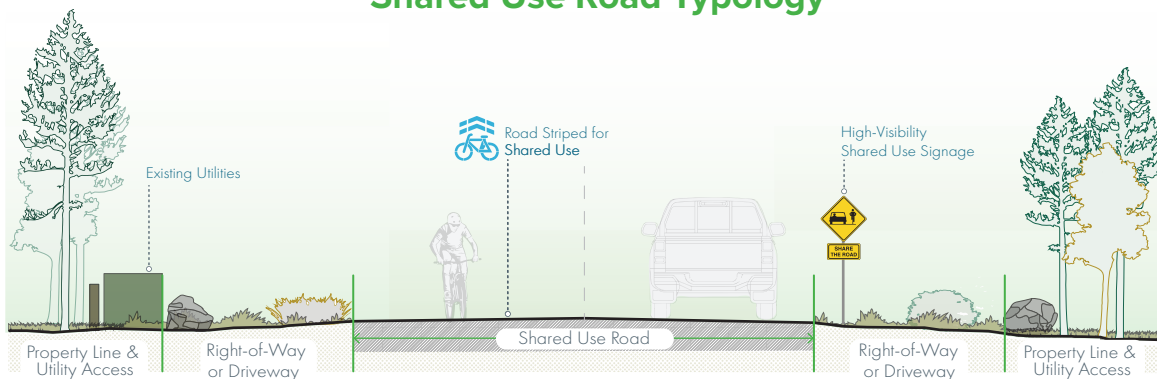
The above graphic showcases the desired condition for Shared Use Roads. These should be incorporated along existing roadways that are constrained to a narrow corridor and cannot be widened due to adjacent utilities, drainage, or narrow right-of-way.
